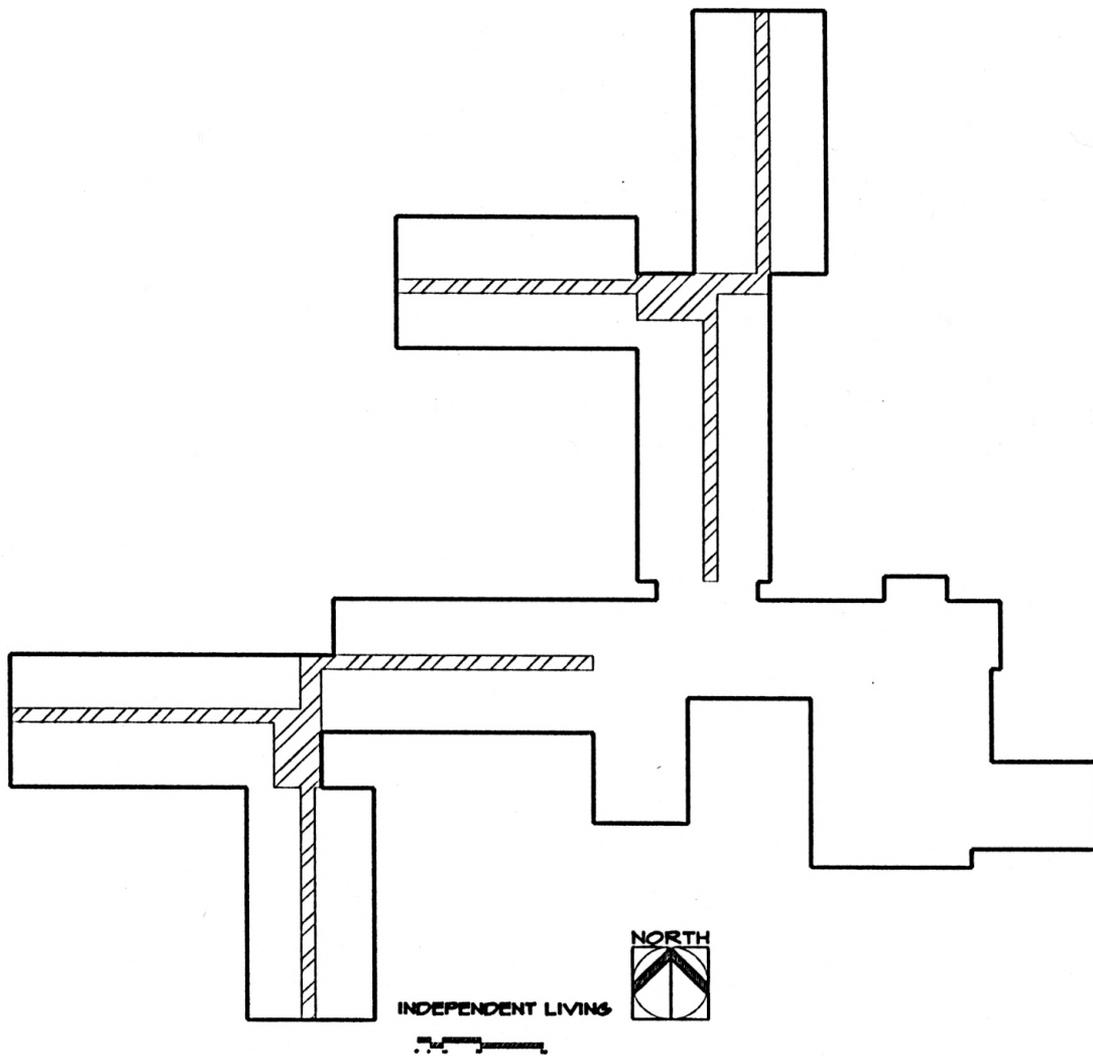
Plan of Independent Living Hallways - Site 1.
